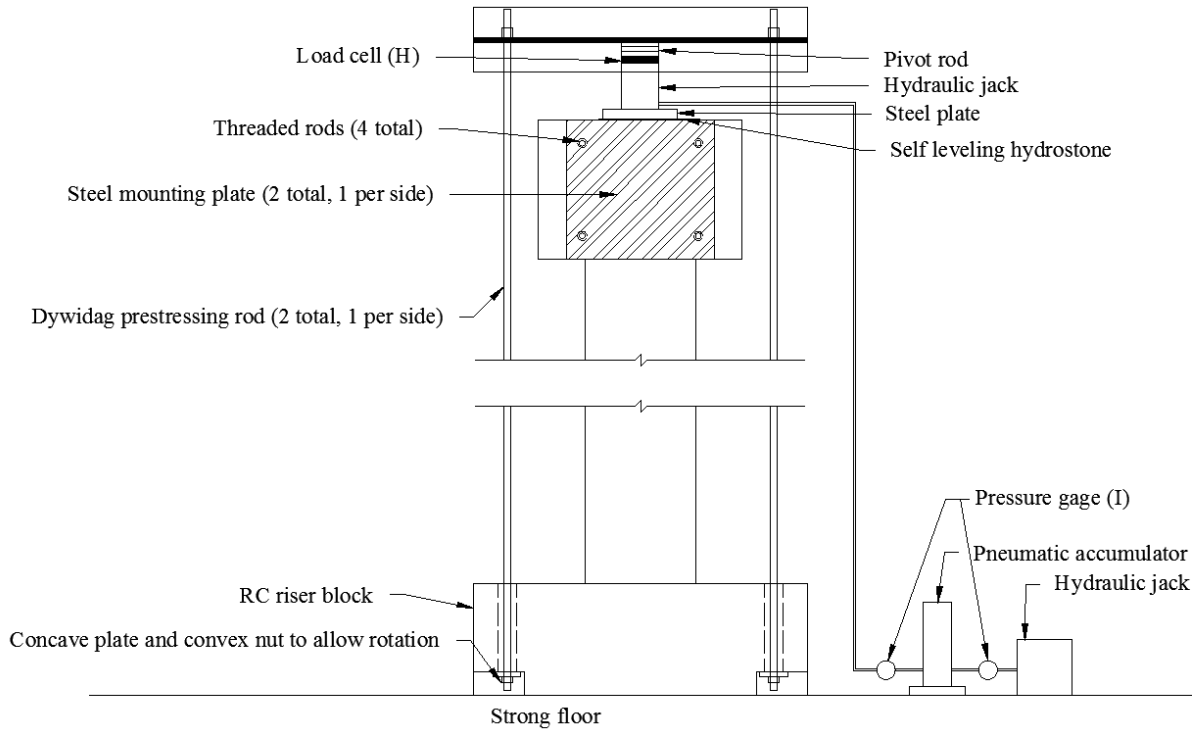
Column C1, C2, C3 and C4 south elevation of test set-up
